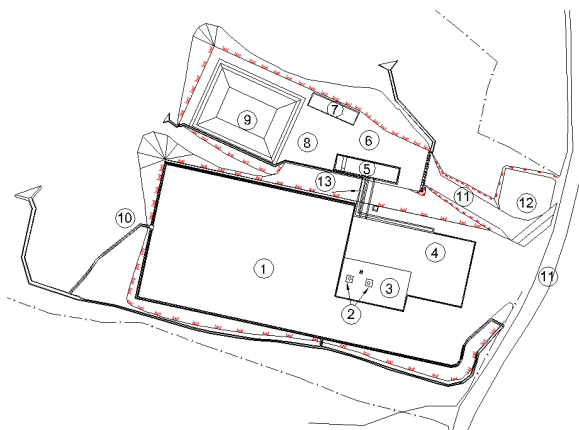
View of levels and survey of the Chinameca drill site; 1. Main terrace; 2. Parking; 3. Sludge tank and drying area; and 4. Water tank terrace
